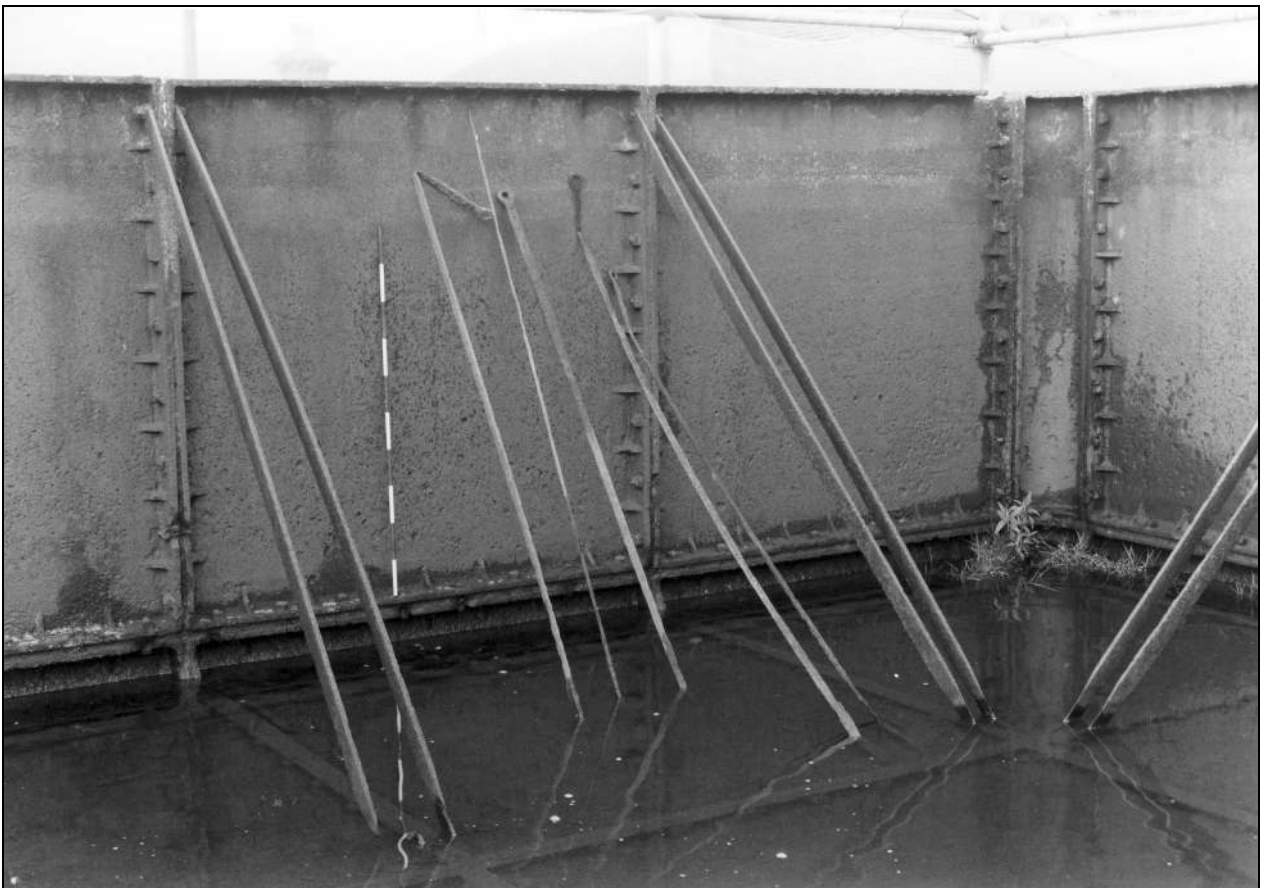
Side of water tank with existing and former struts (film 7, frame 8)
